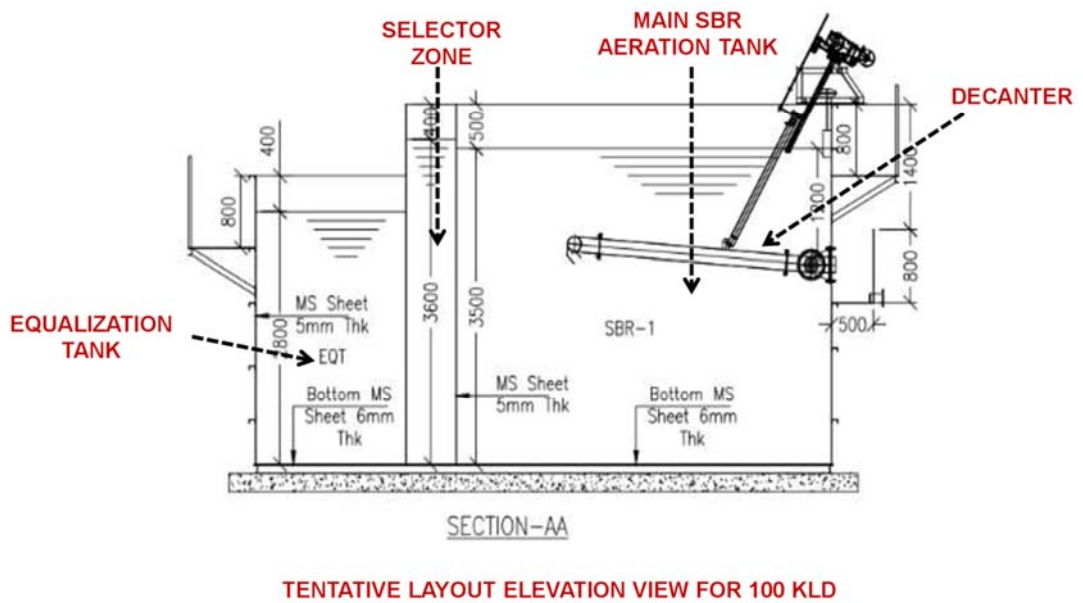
Typical design of pilot-scale SBR installed at Jagjeetpur, Haridwar (Side view)
